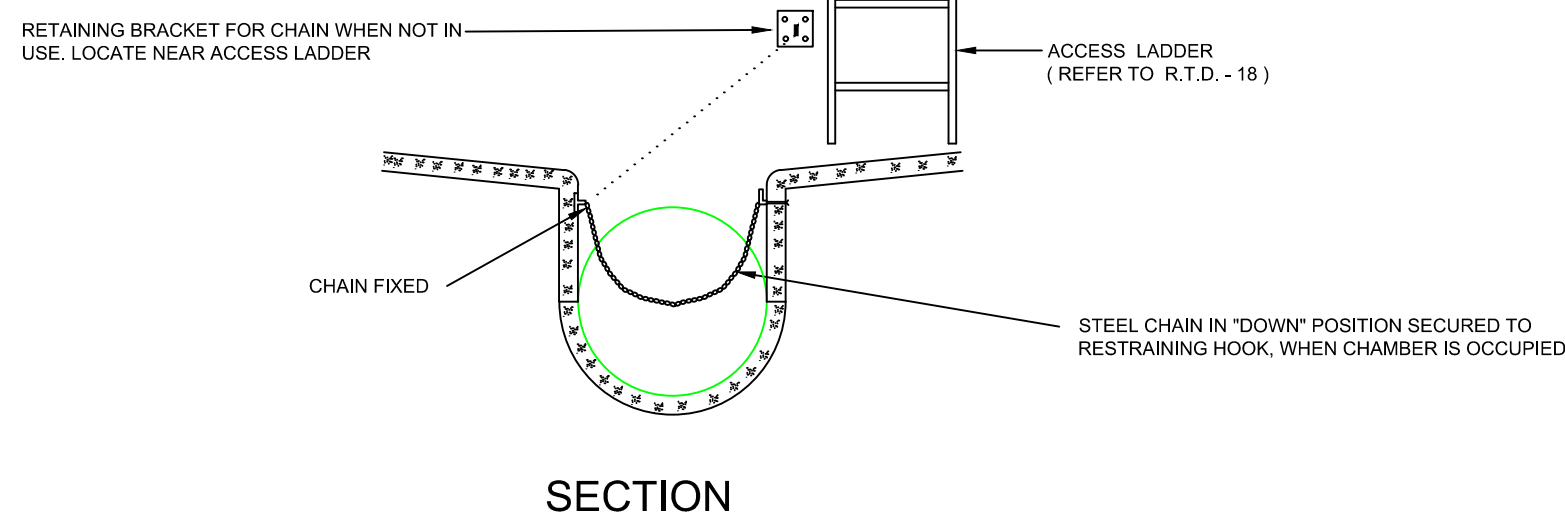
DETAIL OF SAFETY BAR DETAIL OF BACK-DROP TO MANHOLE
